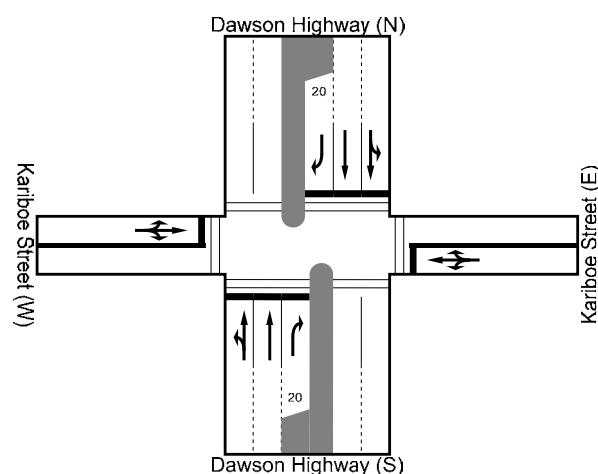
Existing Dawson Highway/Kariboe Street intersection
